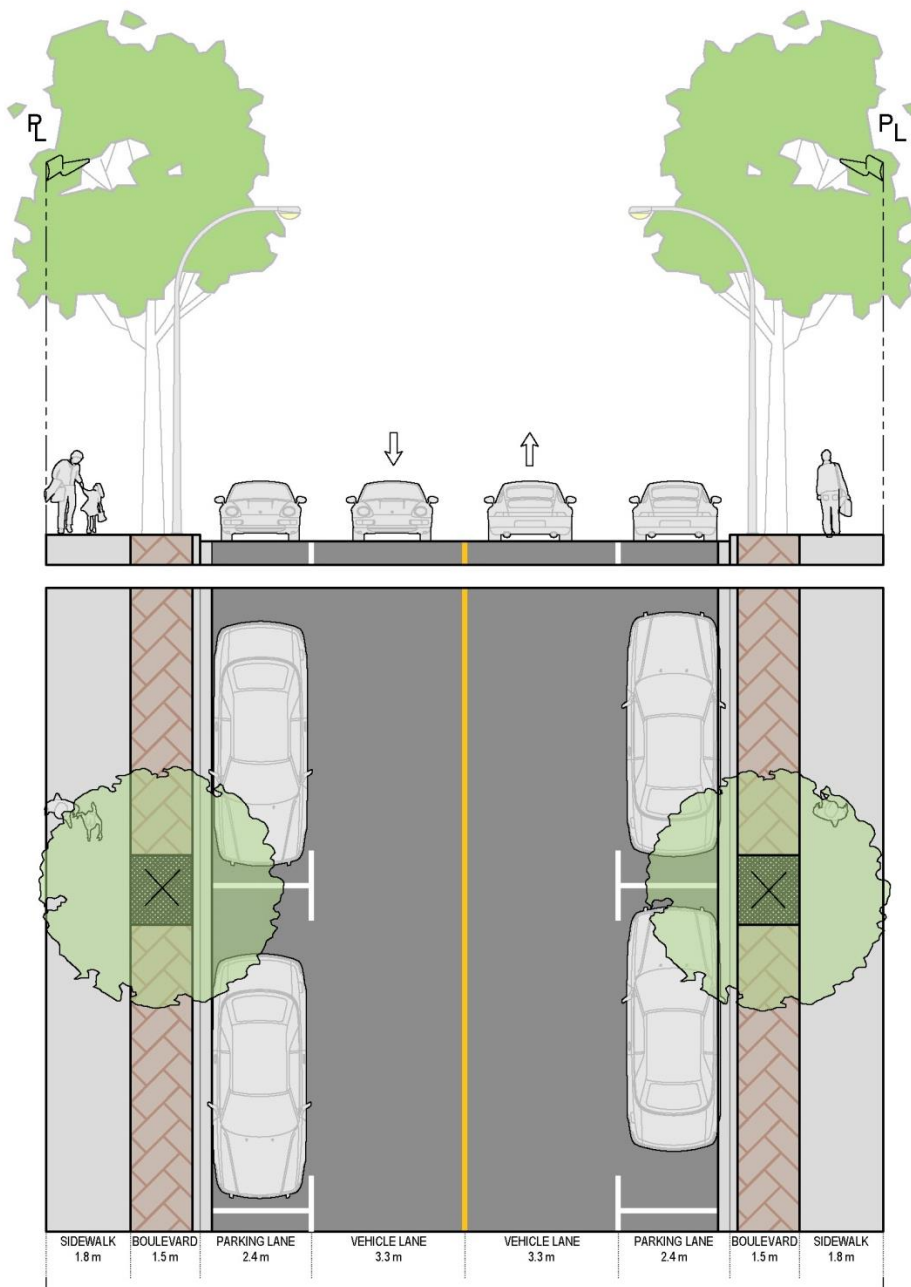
Cross Section: Montrose Avenue (Clayburn site)
